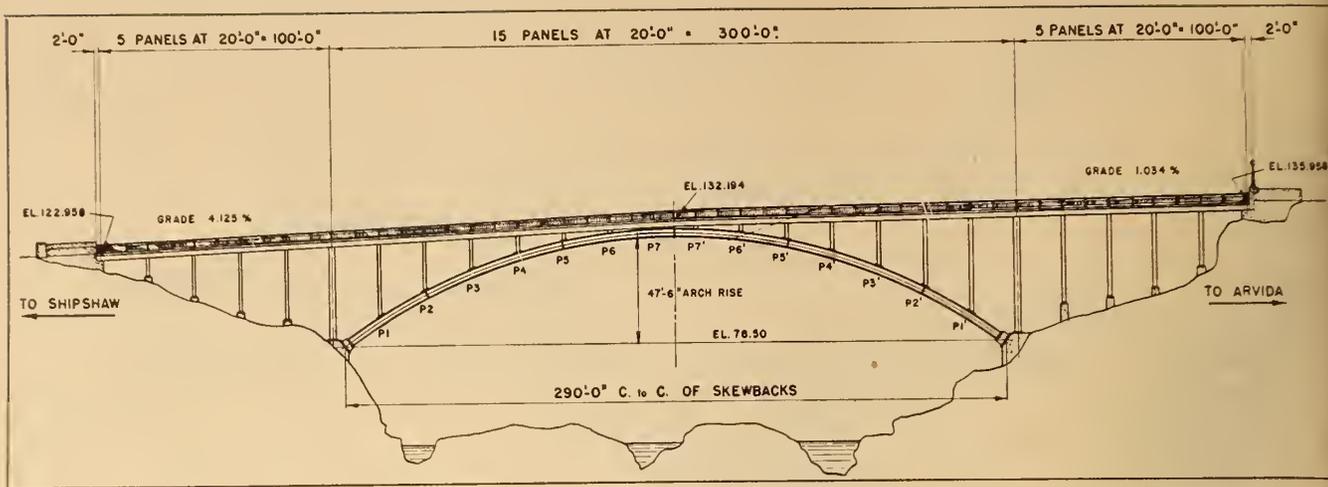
Elevation of Aluminum Highway Bridge at Arvida.
